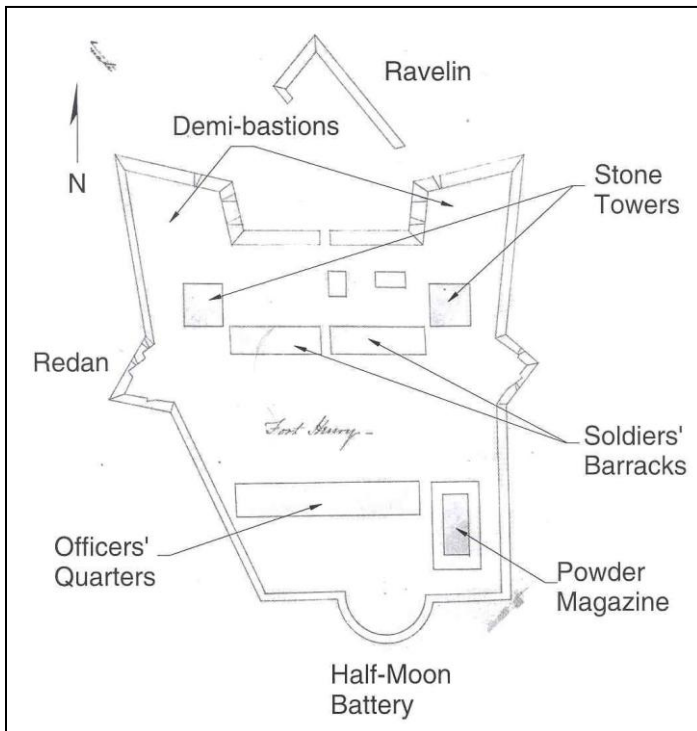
Plan of the first Fort Henry, showing structures and design elements.
